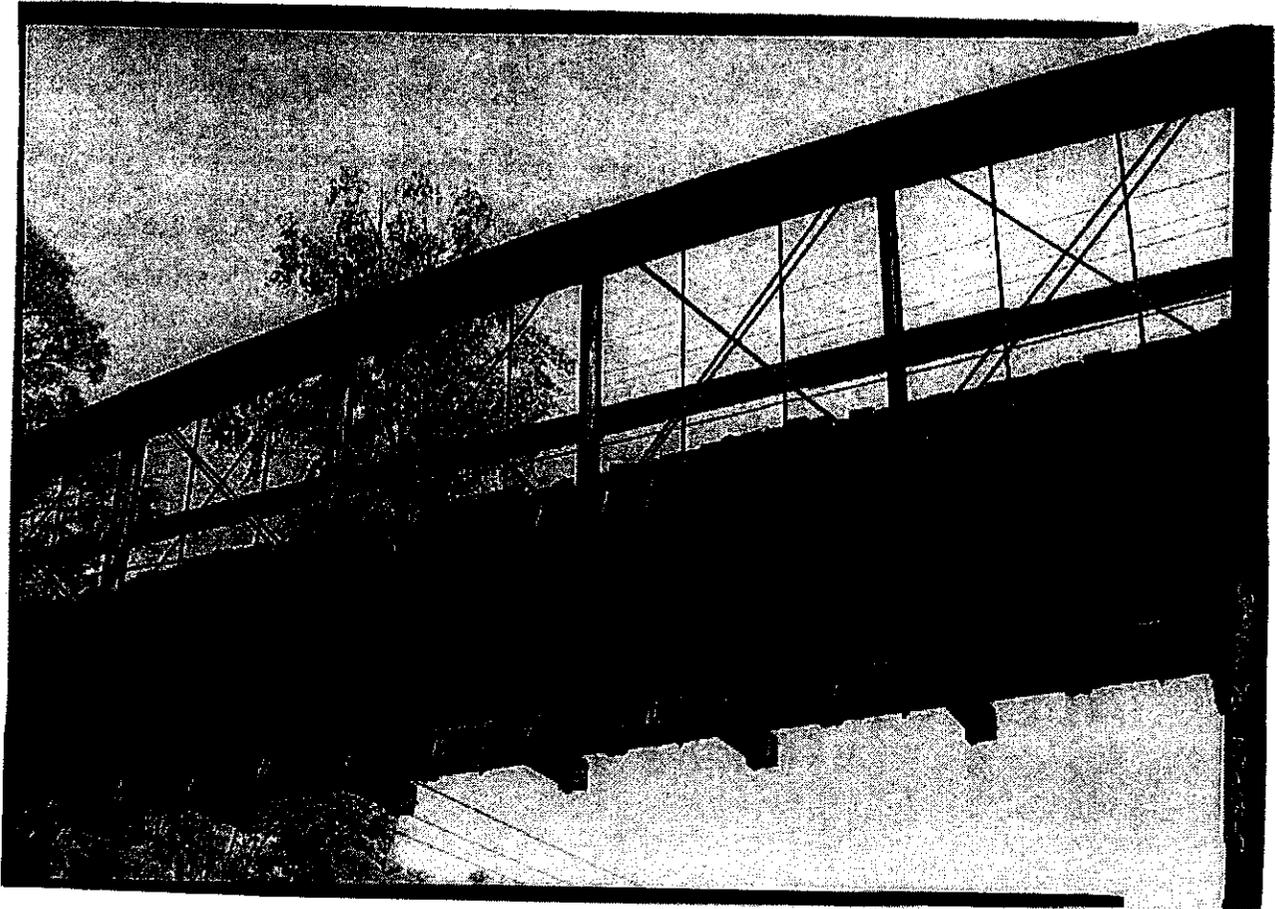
Northfield Parker Truss Bridge, HAER No. VT-13. Bridge fabricated by Boston Bridge Works, ca. 1870. Northfield, Washington County, Vermont. (From LC-HABS/HAER website.)
